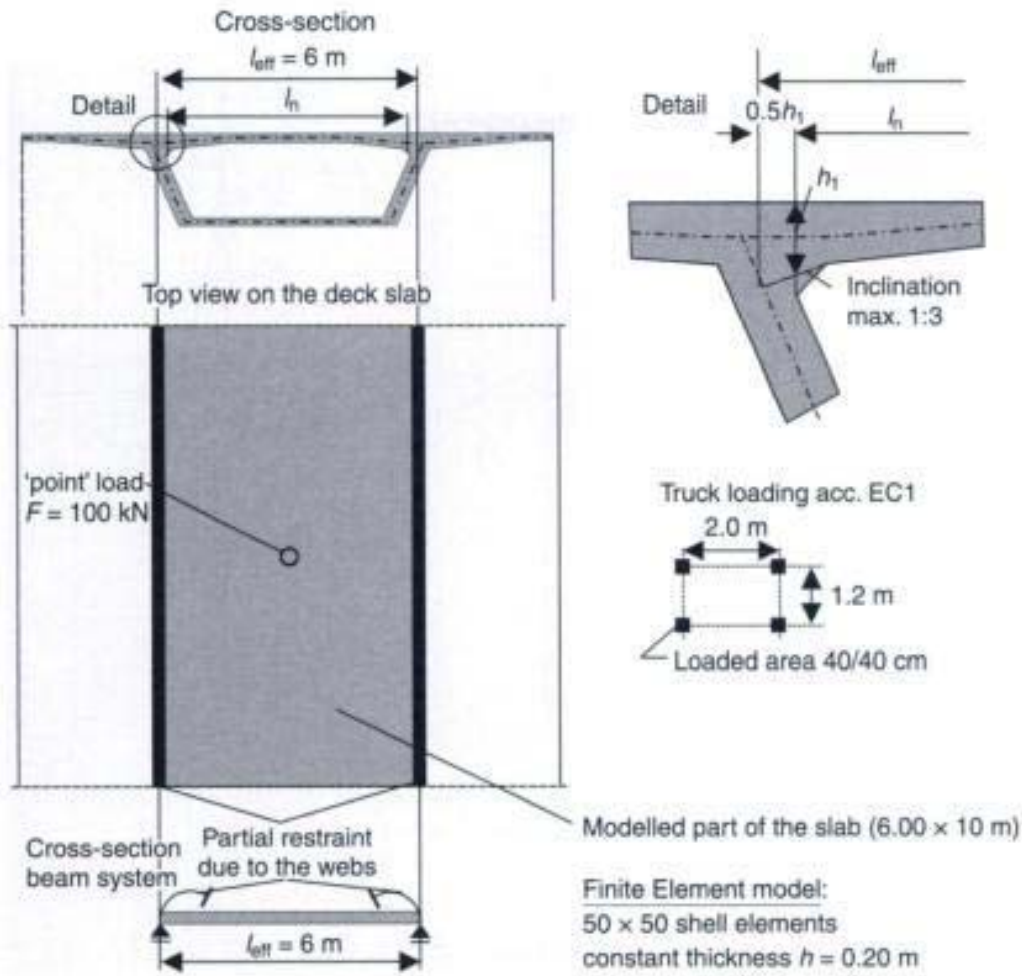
Equivalent slab model for the deck of a hollow box girder bridge
